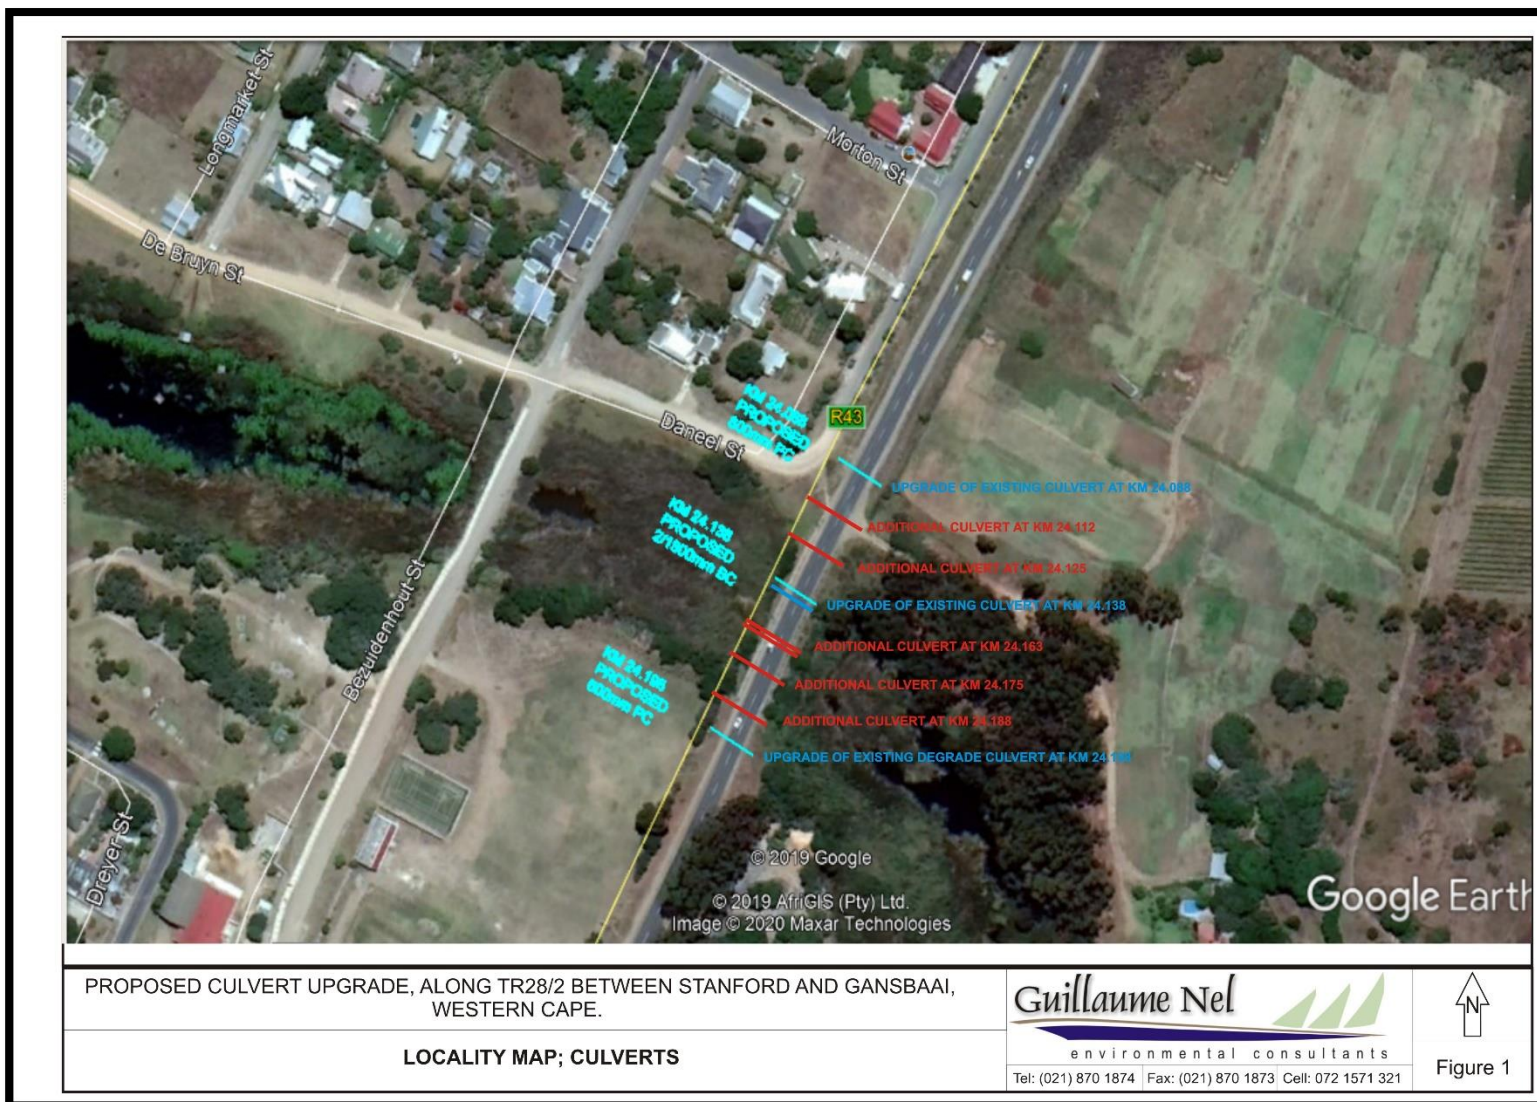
Locality Map of the triggered culverts to be upgraded and the installation of additional culvert along Trunk Road 28, Section 2, between Stanford and Gansbaai.
